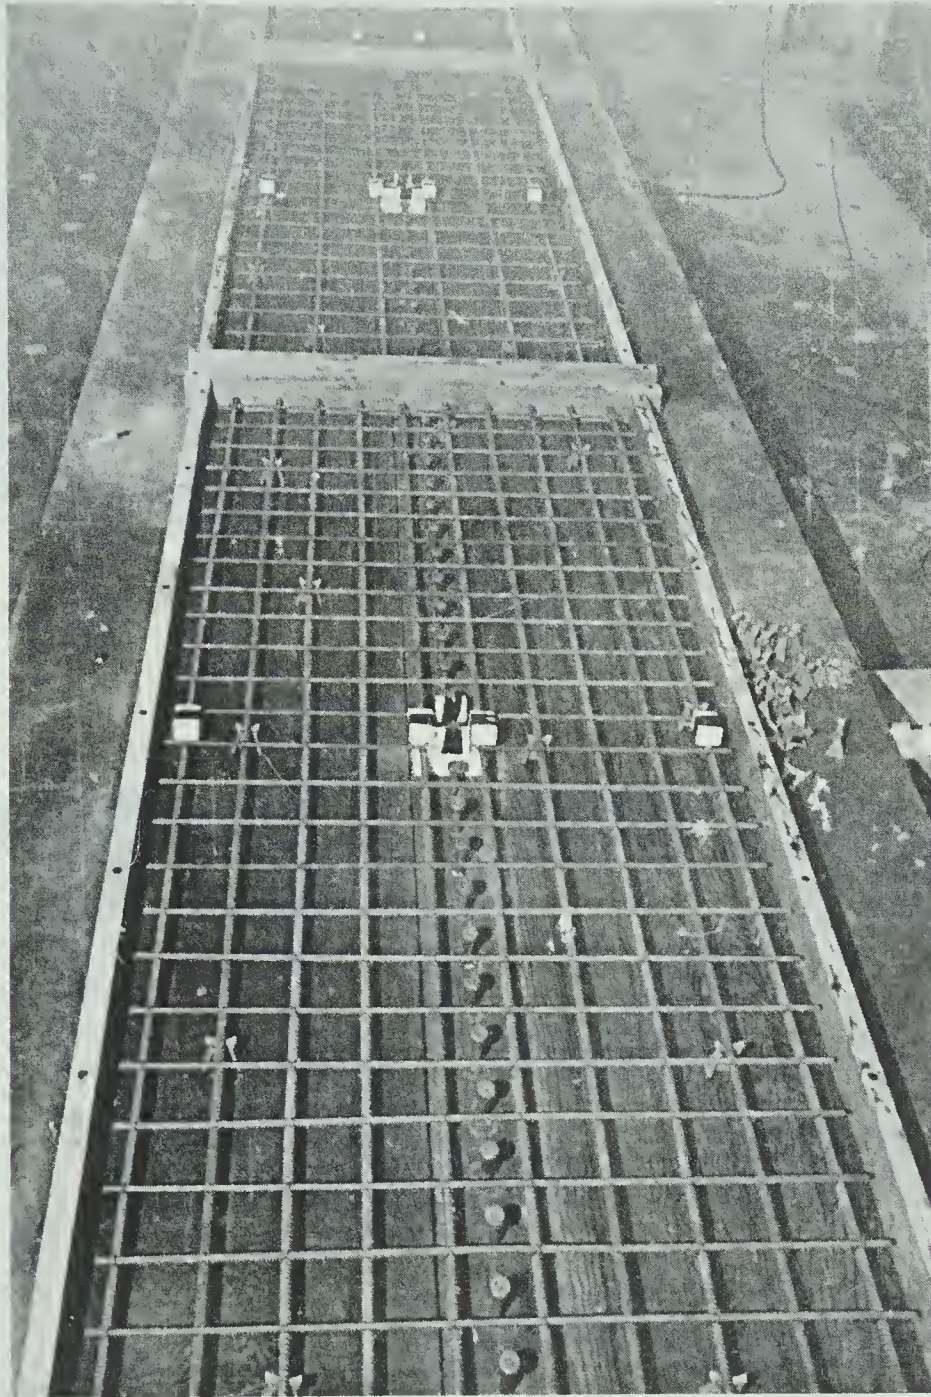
12WF31 SPECIMENS PRIOR TO CASTING
